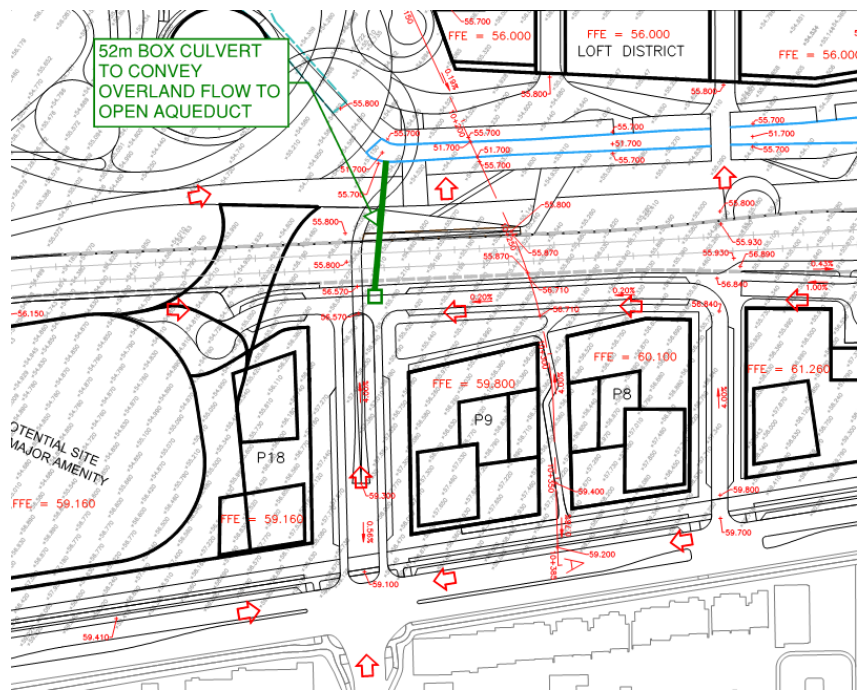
Overland Flow to Box Culvert Under OLRT Track
